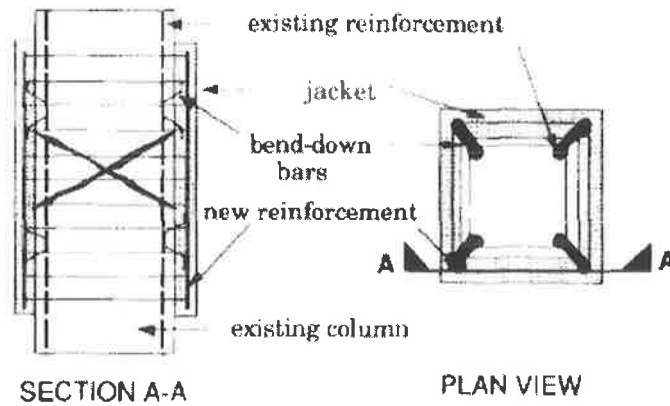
Concrete jacketing (Frangou et al. 1995)
